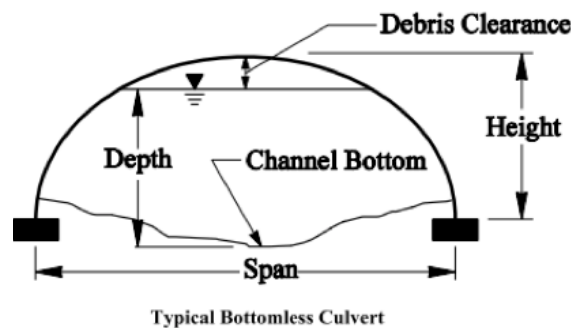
A "bottomless culvert" or plate arch is often used to meet fish passage requirements. Not a true culvert (culverts are closed conduits), it has lateral foundations that support the span and the natural channel bed carries streamflow through the structure.
